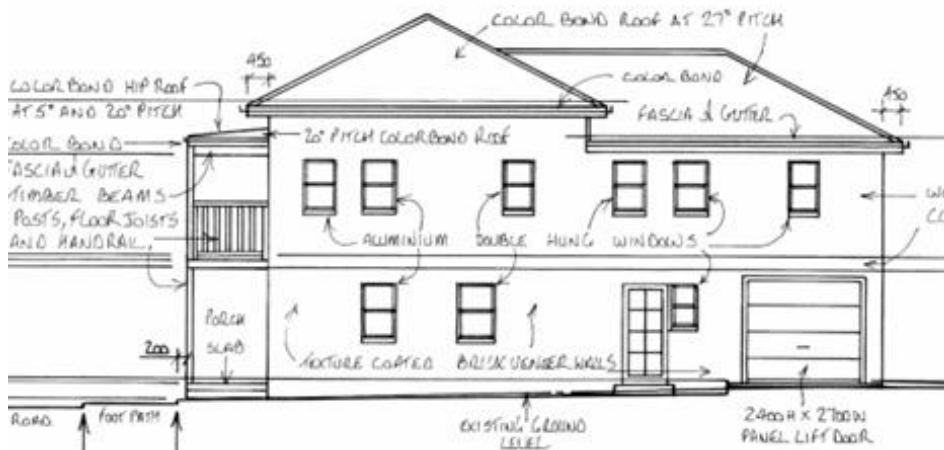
Proposed driveway elevation (East). (Source: Raymond Terrace Planning).
